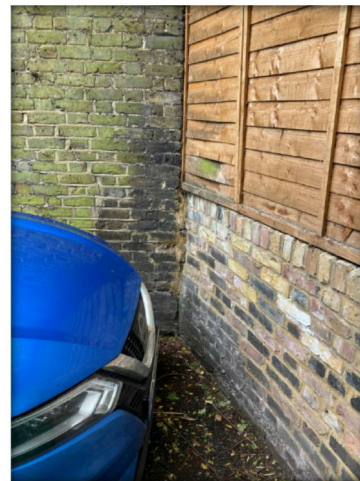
Photograph Of Damage Expressed To Eastern Flank Wall, Adjacent to T05 – Common Lime.
